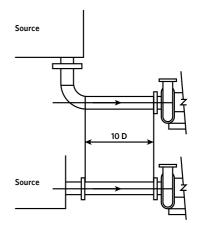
| TYPICAL SINGLE END-SUCTION PIPING ARRANGEMENT
